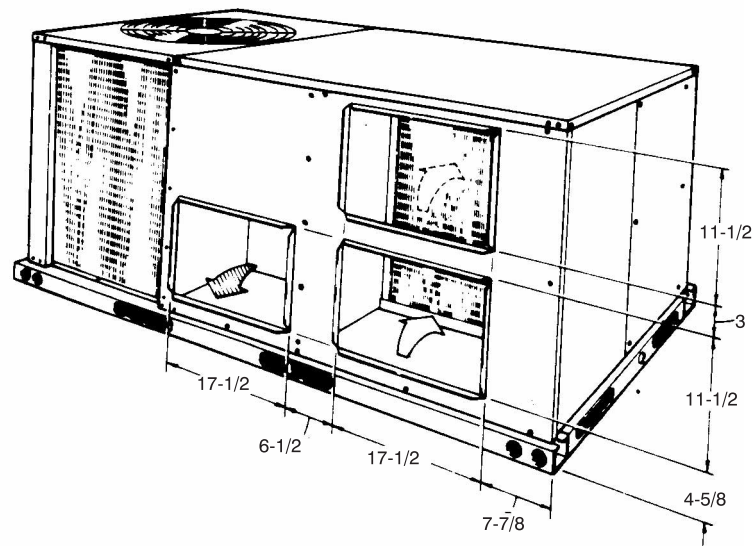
DEE/DEG DIMENSIONS REAR VIEW - 3, 4, & 5 TON
